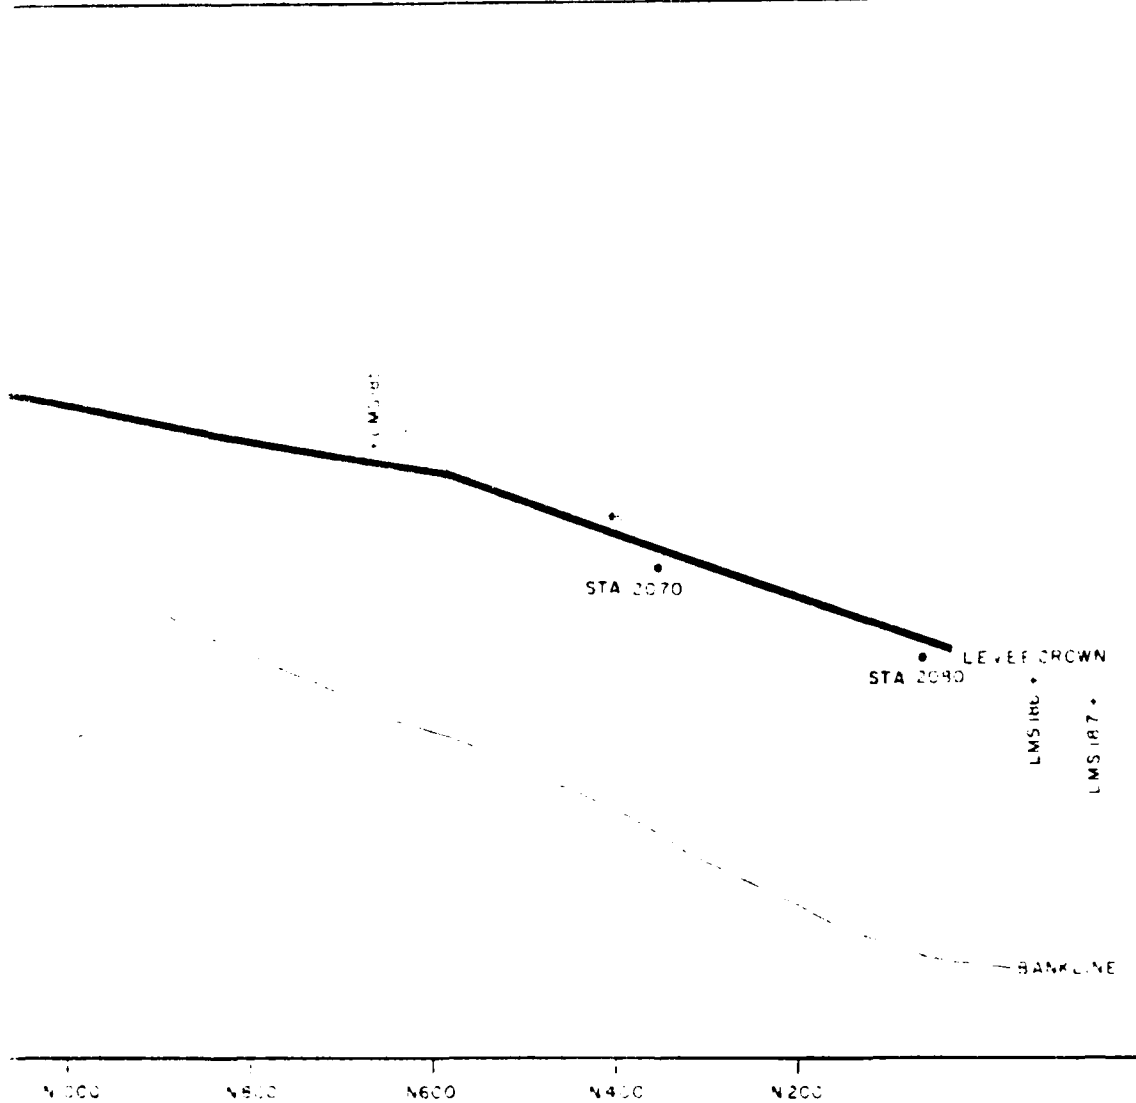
SITE PLAN OF THE NEW RIVER SURVEY AREA
